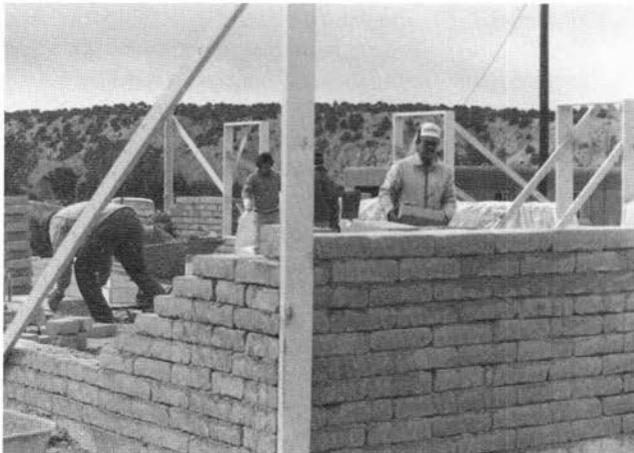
Pressed-earth-block house under construction. HUD building site, Nambé Pueblo.
